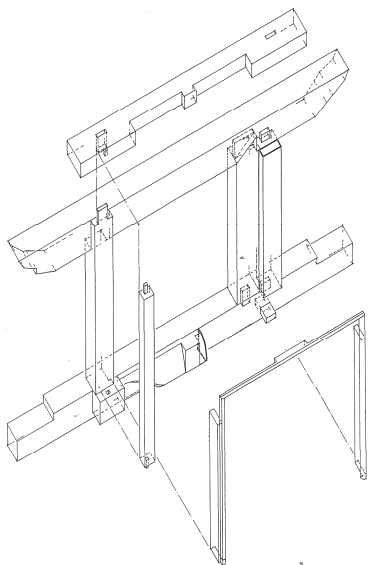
Structural elements of a window (after Gutschow, 1987)².
